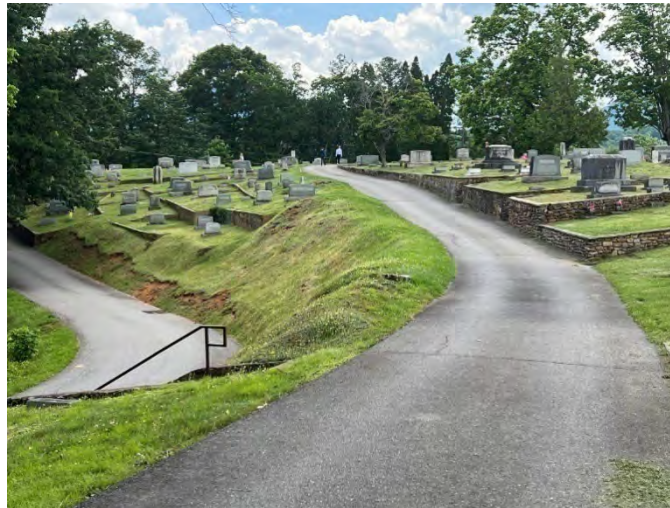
View southwest of a low concrete retaining wall on the west side of the cemetery.
